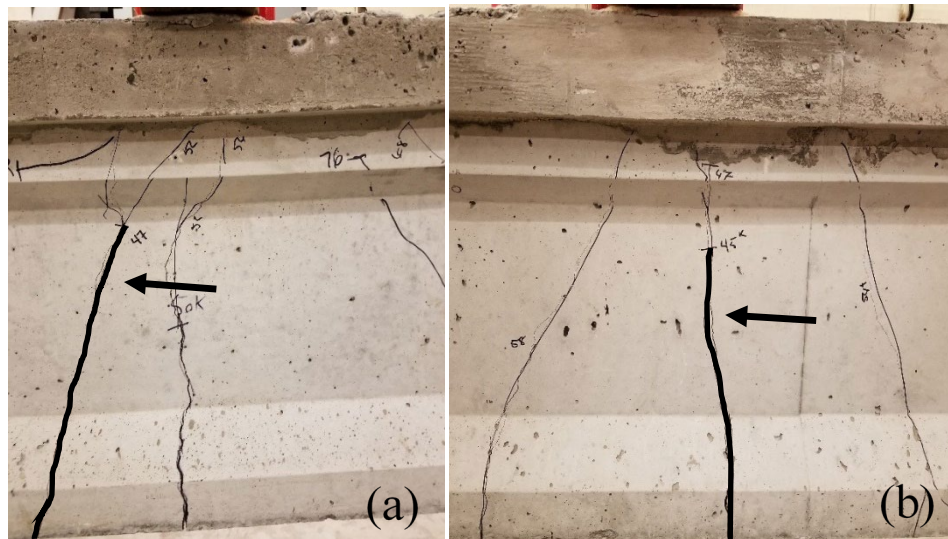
Initial flexural cracking under the load point on the NC2-N girder at 47 kips of load (a) and initial flexural cracking under the load point on the NC2-S girder at 45 kips of load (b). Arrows point to the dark lines that indicate the initial flexural cracks.
